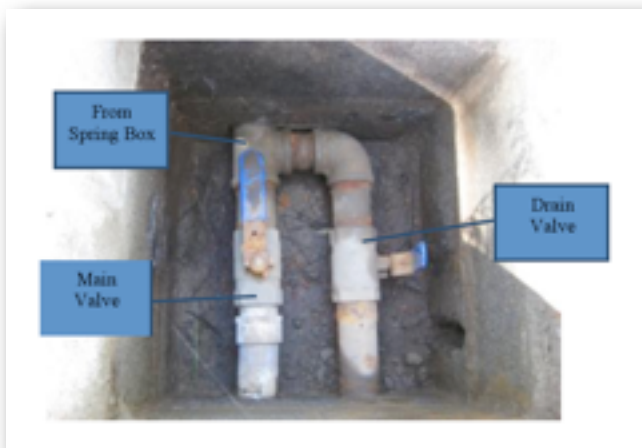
Valve box details showing the normal positions of the main valve open and drain valve closed.
